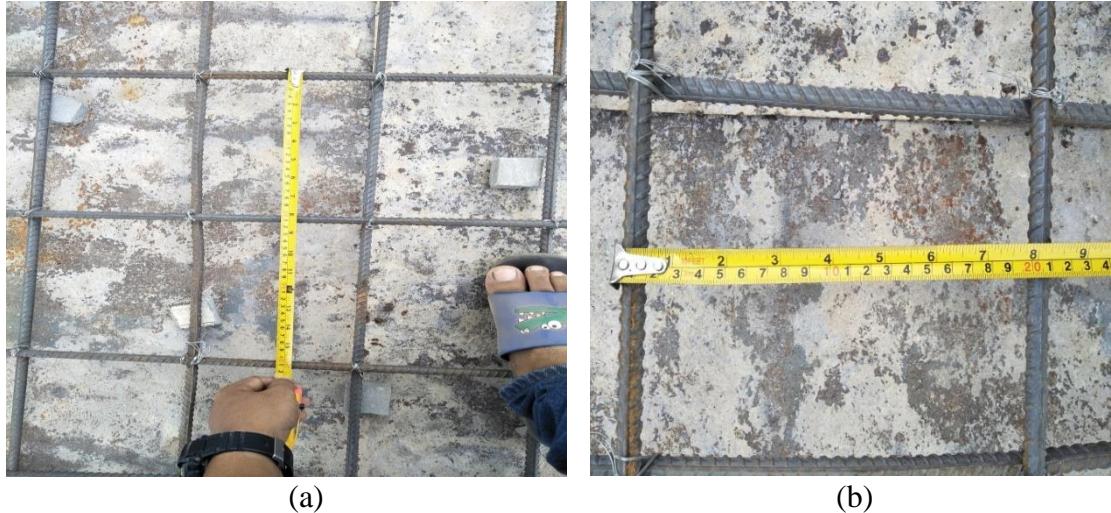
(a) Spacing of bottom bar (b) Spacing of top bar
